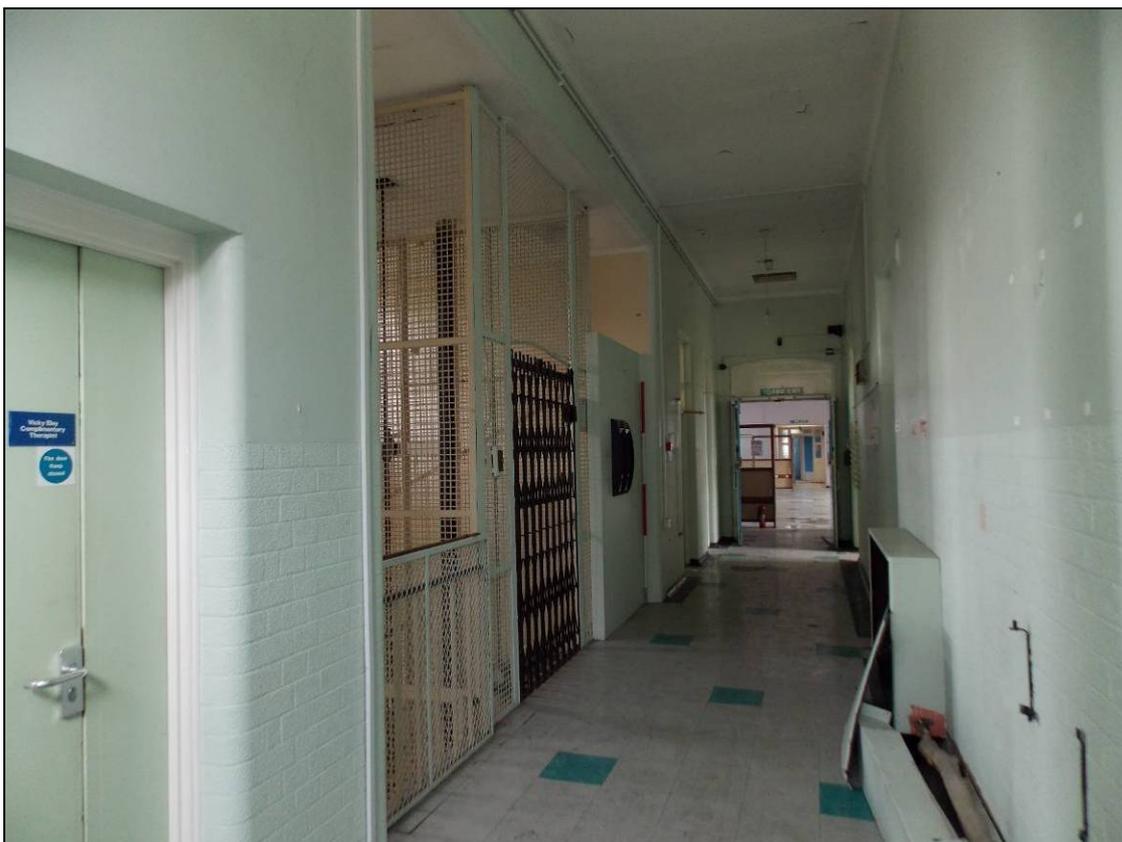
Central corridor with obsolete lift and staircase, looking north (scale 2m).
